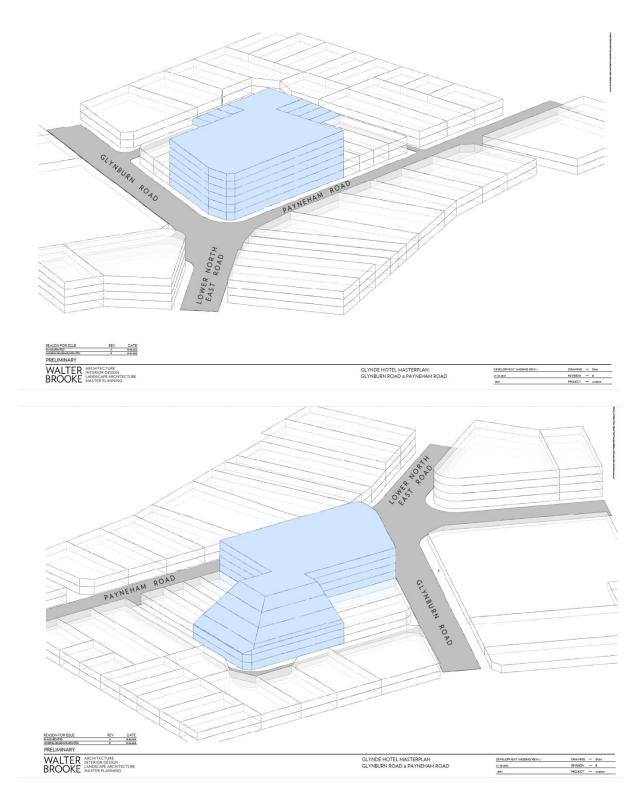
Building Diagram Example – 6 building level with 30 degree interface setback
